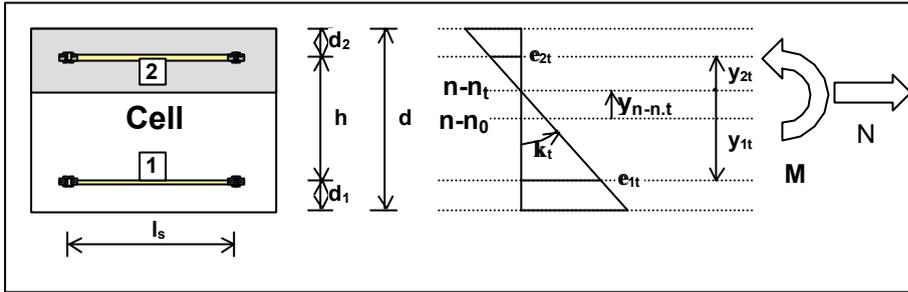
Parallel topology in a segment of cracked concrete beam
